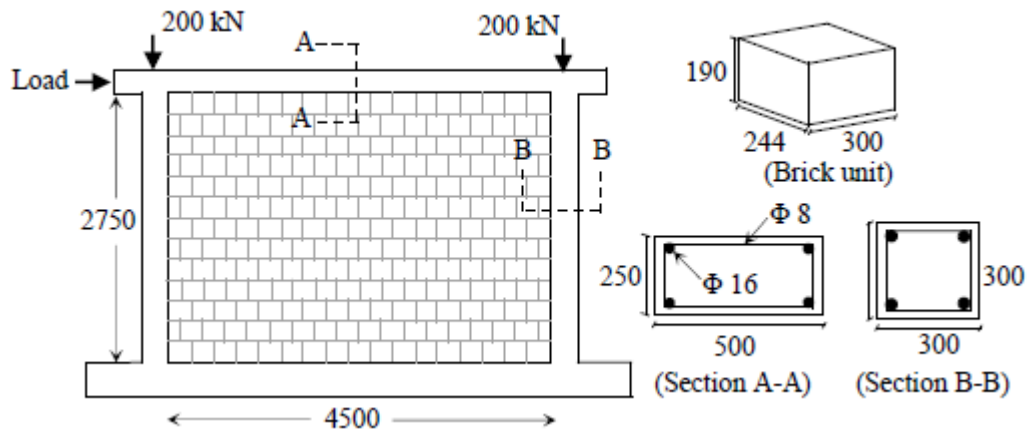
Geometric details of the selected infilled frame (INSYSME 2016) with RC section details and block dimensions (dimensions in mm).
